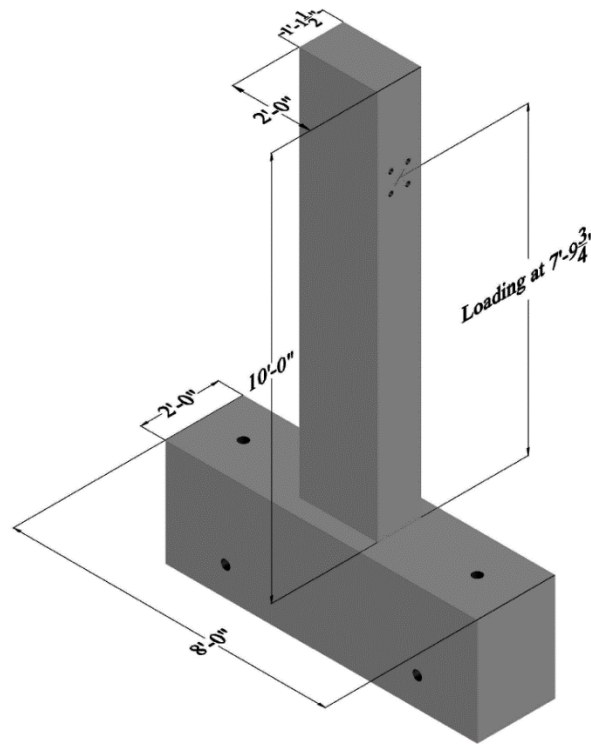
Geometry and Dimensions of Test Beam Designs
